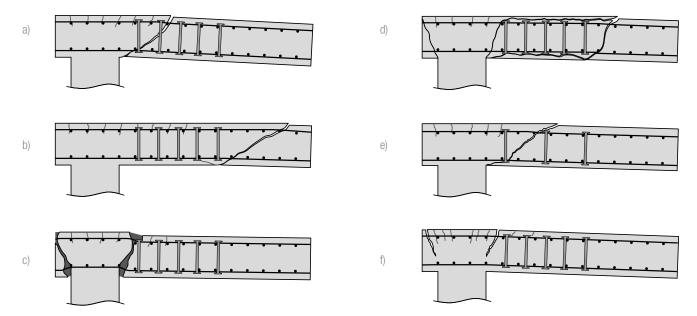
Failure modes of slabs reinforced with punching reinforcement [6]
